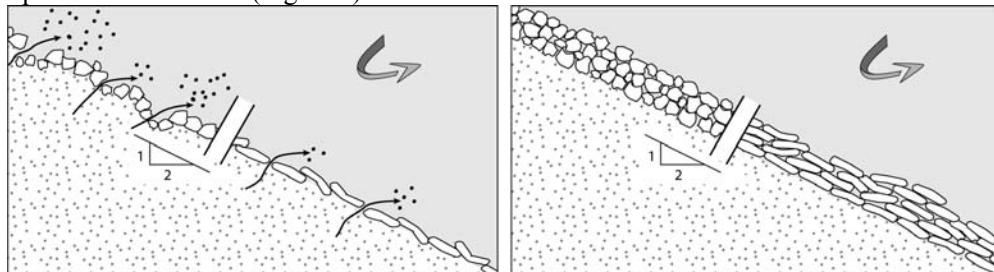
Multiple layers of rocks and geobags are capable to protect the fine subsoil
